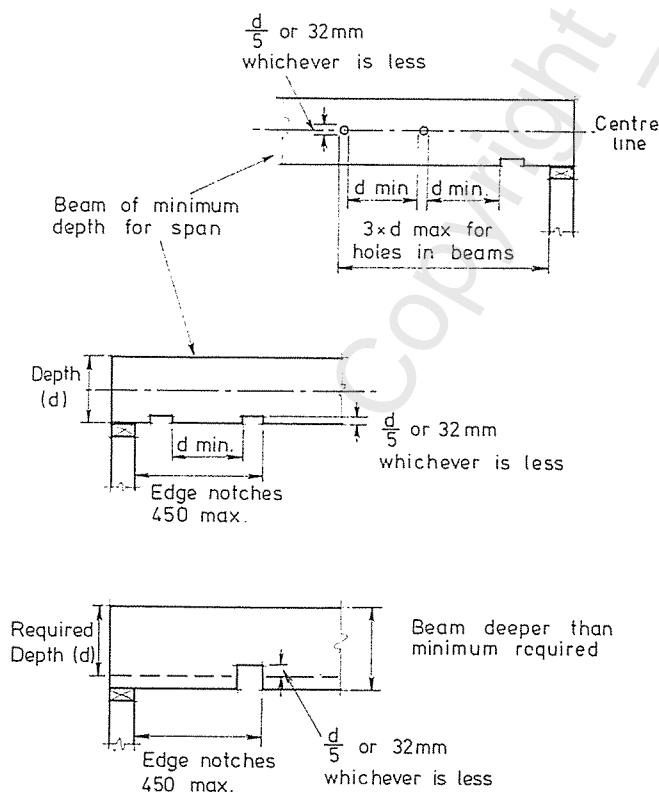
Holes and notches in floor joists other than cantilevered joists
